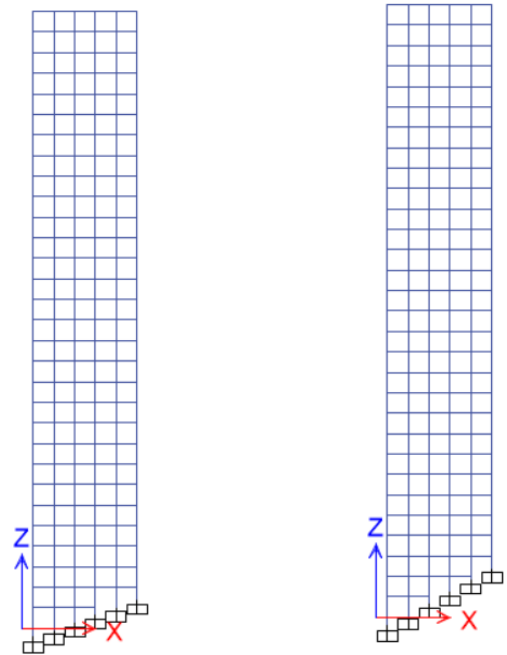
With-out Bracing Steel frame on 20-degree Ground and 30-Degree Slope
